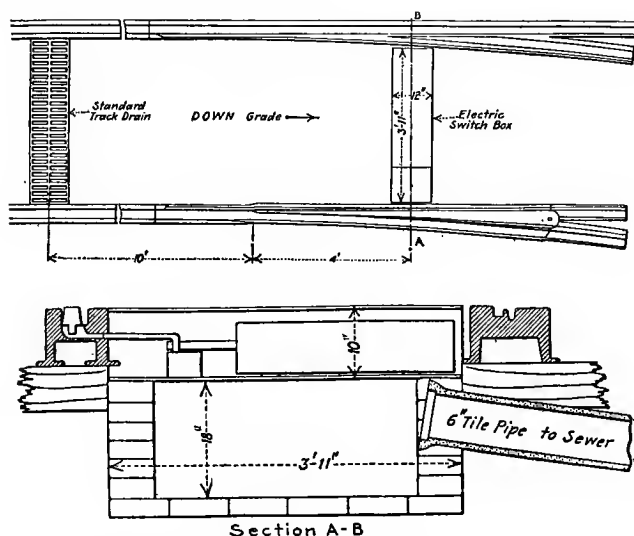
TRACK SWITCH INSTALLATION SHOWING PROVISION FOR DRAINAGE
